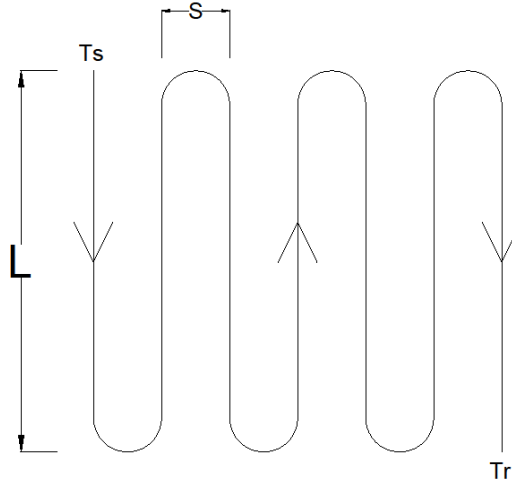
Plan view of an embedded tube for the radiant floor system
